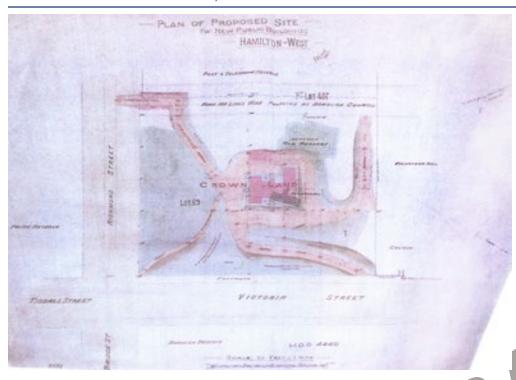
"Plan of Proposed Site for new Public Buildings, Hamilton West". J. Louch, 1887. The redoubt is shown at top right, the darker building footprint is the Old Public Works office and the proposed building is shown in pink. North is to lower right. Archives NZ.
